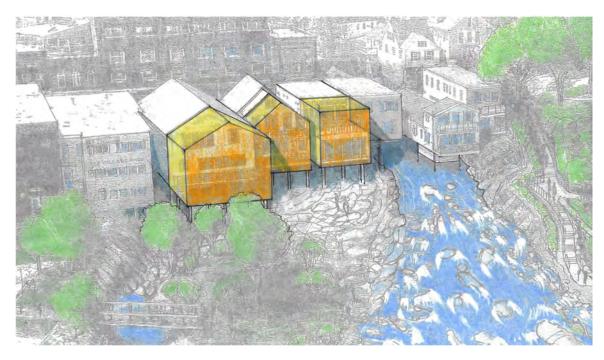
Conceptual perspective sketch of a building extension option behind Main Street buildings.
